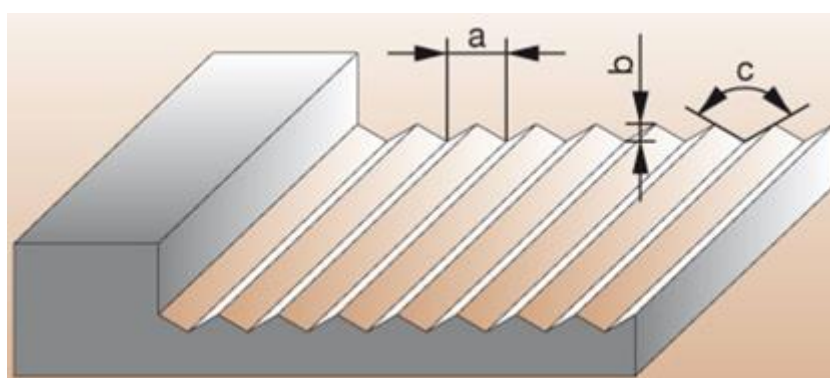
Representation of a milled surface with a = tool spacing; b =base height; c =break-out angle (©Wirtgen)
